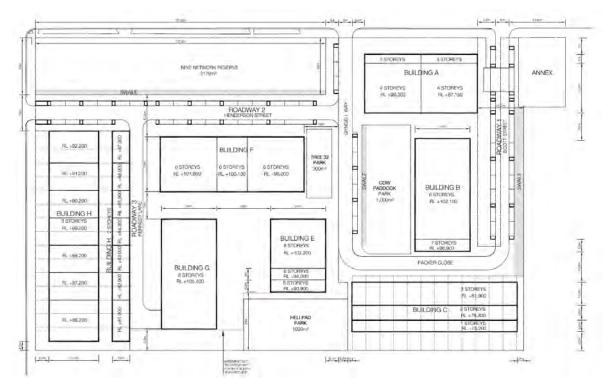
Approved location and extent of building envelopes on the site. (Source: Platform PPS)
